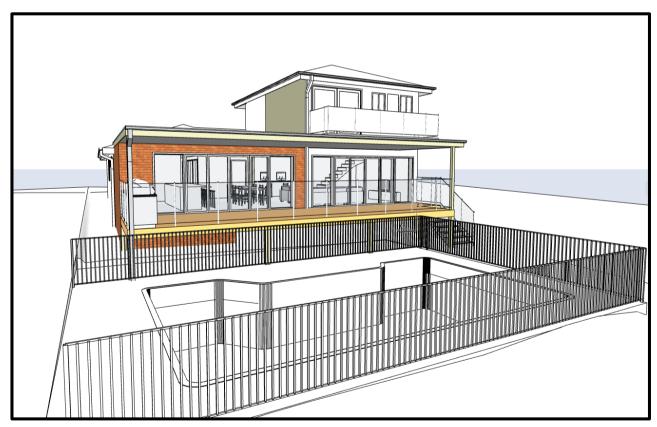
Proposed works at No. 209 South Creek Road. (Action Plans 2019).
